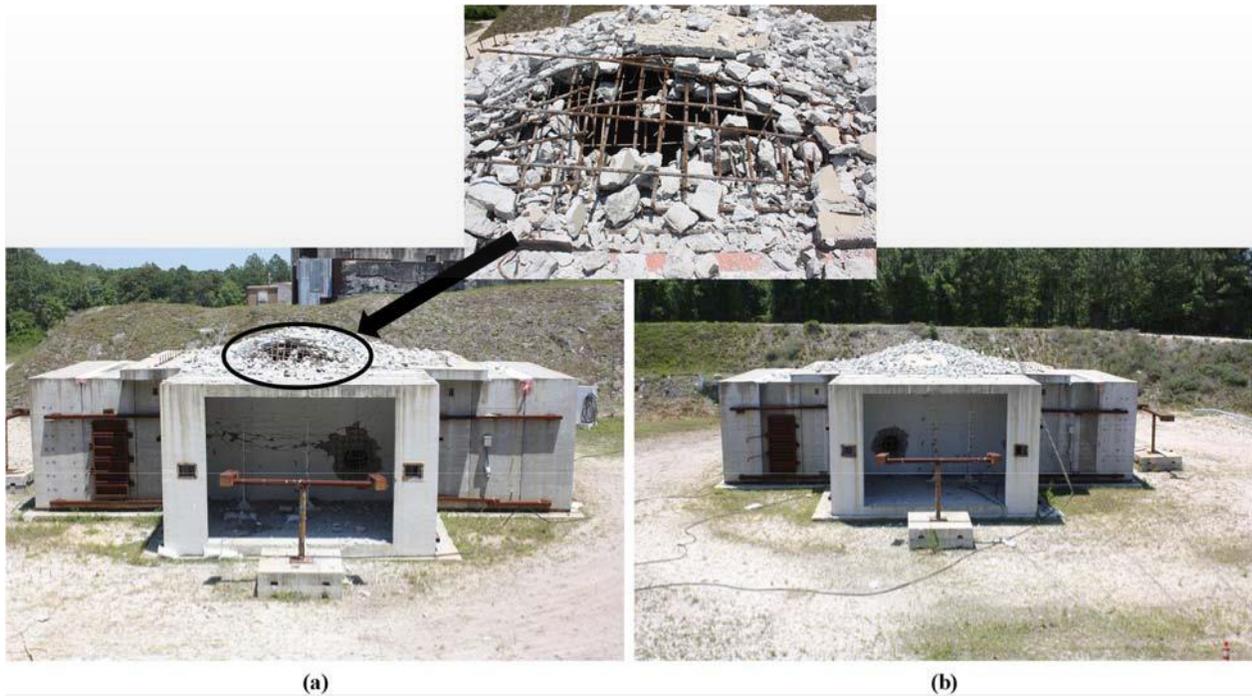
Performance of roof system post Test 3; (a) Roof-wall connection for Baseline RC wall with callout to roof damage; (b) Roof-wall connection for Test RC wall
